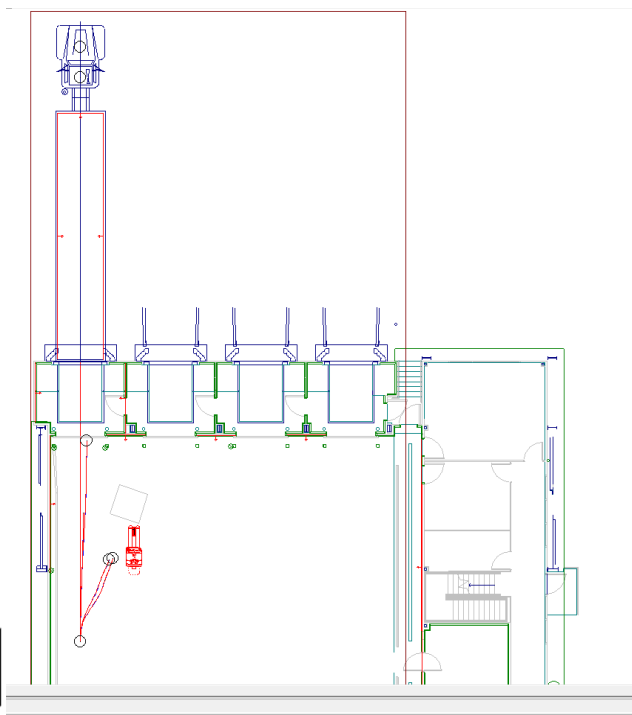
Layout Configuration for use with loading dock 4 Figure 18: Initial scan of loading dock 4
